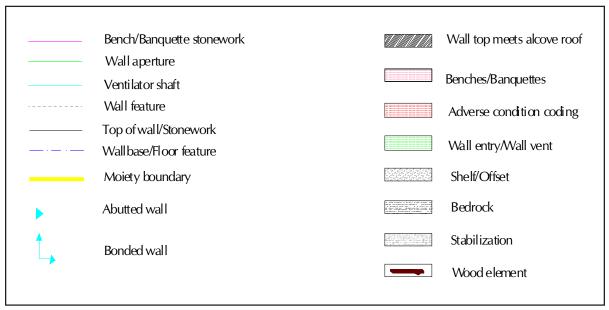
Line and hachure key for Plan Views and Elevations.
